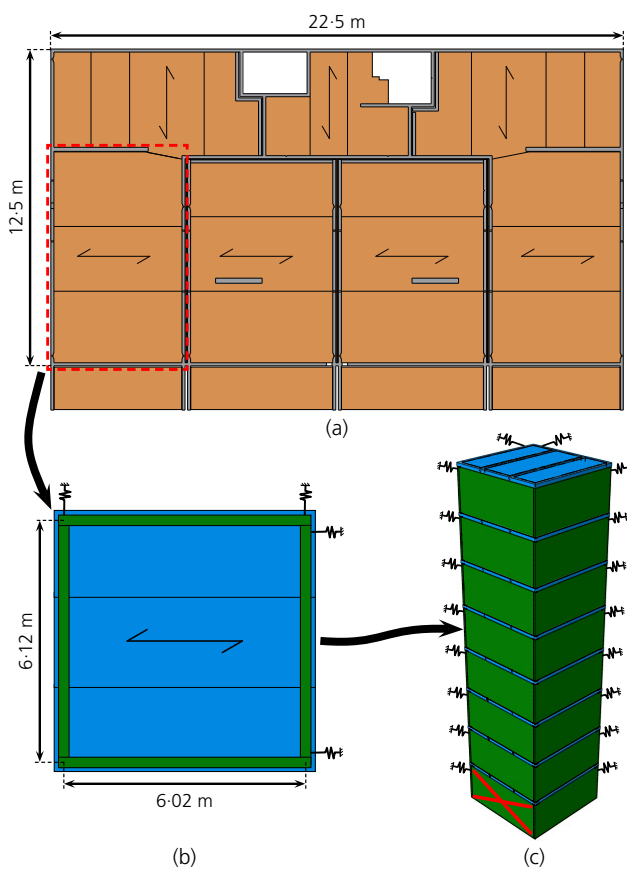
Studied building: (a) floor plan of the case building including balconies, with the investigated bay highlighted; (b) simplified floor plan of the investigated bay; (c) simplified model of the studied corner bay indicating the removed wall
